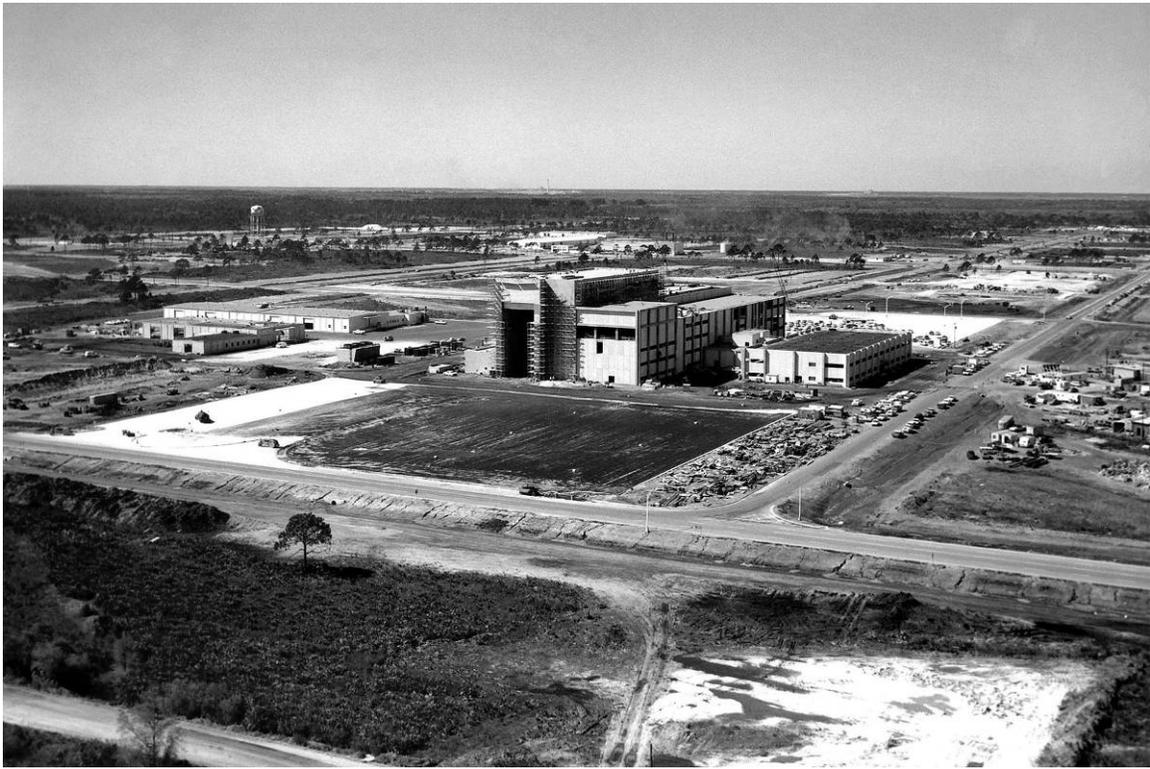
Construction of the O&C Building, facing southwest, 1964.
